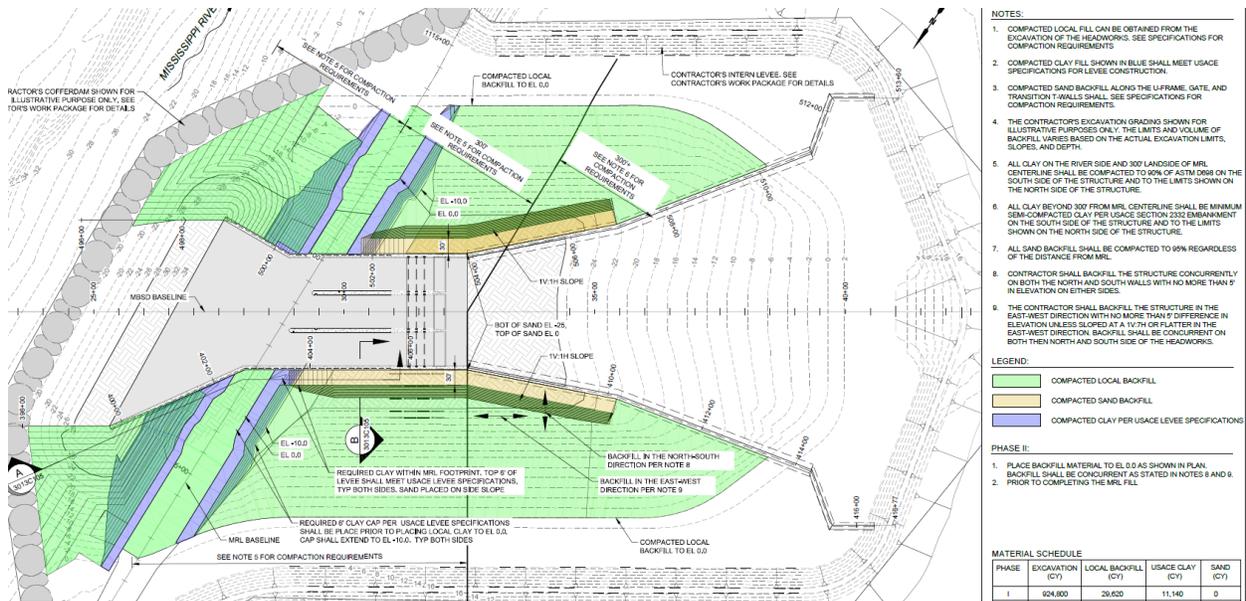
Sand Backfill Adjacent to U-frame and Gated structure Walls – Phase II (shown in yellow)
